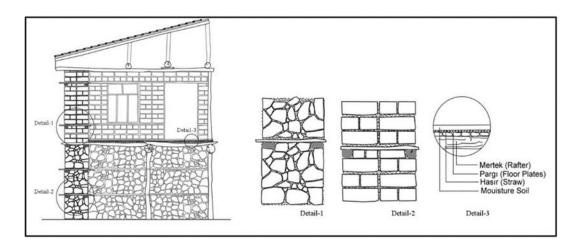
System Section of a Typical Ağlasun House; Detal 1: Wall Section (Rubble Stone); Detail 2: Wall Section (Mud Brick); Detail 3: The Slab Section of 'Saçak' (Kurtulus, Asrav, Güçhan, & Altınöz, 2017)
